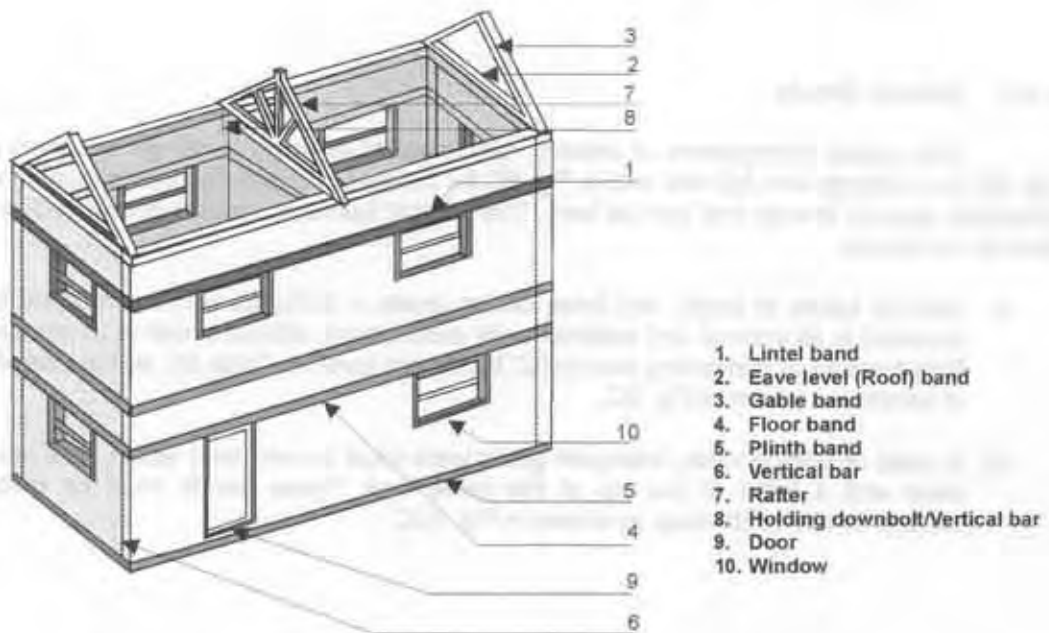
C Overall arrangement of reinforcing in masonry double storey building having pitched roof (Roof not shown)
